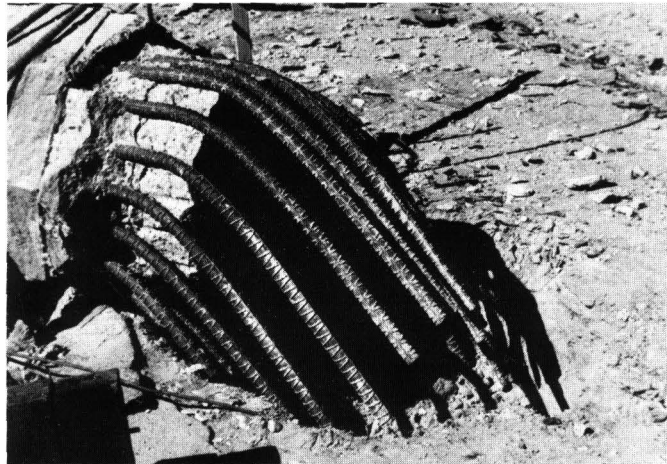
Freeway overpass collapse. Routes 5/210. Column bores pulled from footing. J. F. Meehan, OAC photograph.
